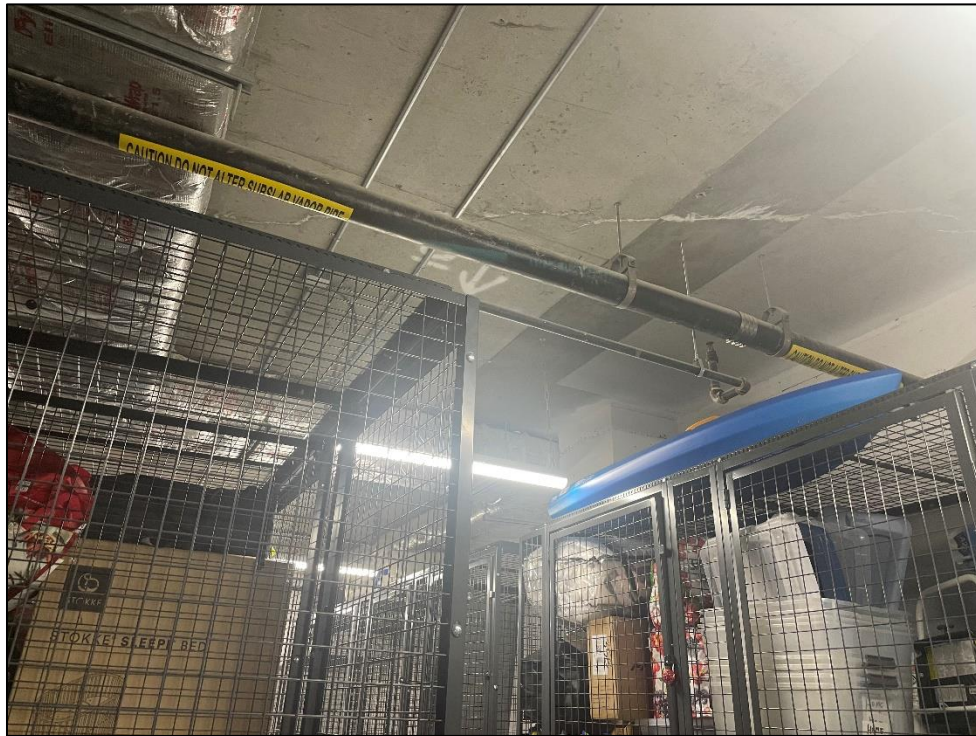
, 05/17/2023: View of labeled SMD piping in storage room (facing northwest).
